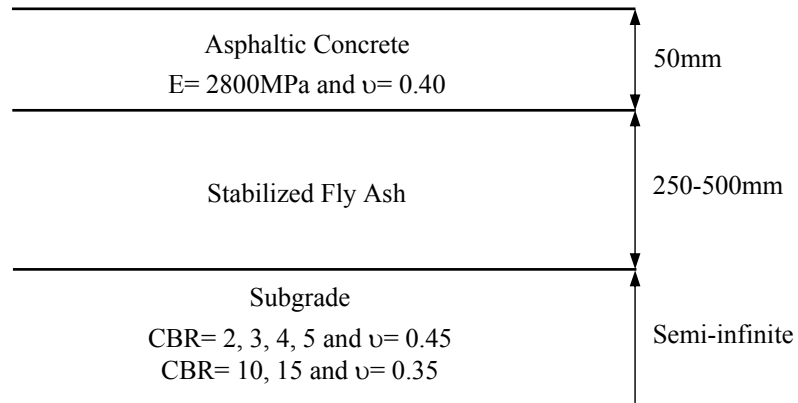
Assumed Pavement Structure Used in the Structural Analyses
